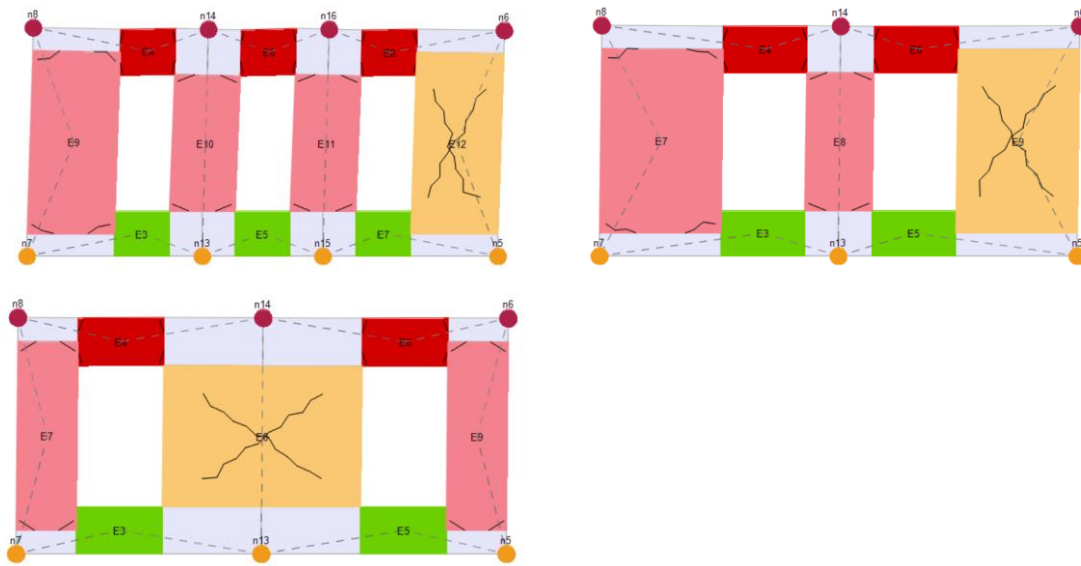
Failure patterns 3MURI Wall 6 (upper-left), Wall 7 (upper-right), Wall 8 (lower-left)
